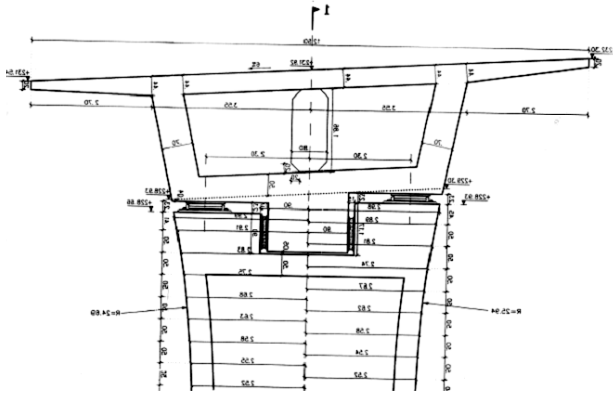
Non-monolithic pier-to-deck connection (end piers)
